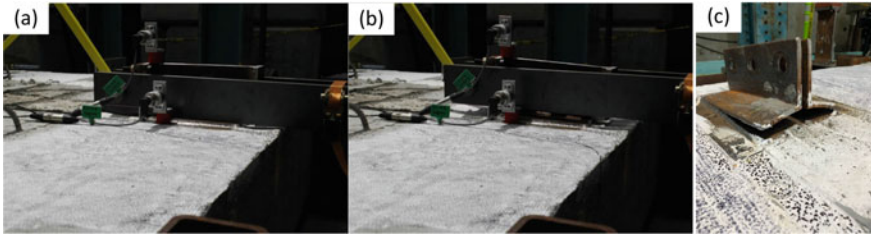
Side view of DA-250 a At the beginning of the test and b Just before weld rupture, c Weld rupture on double angle connection
